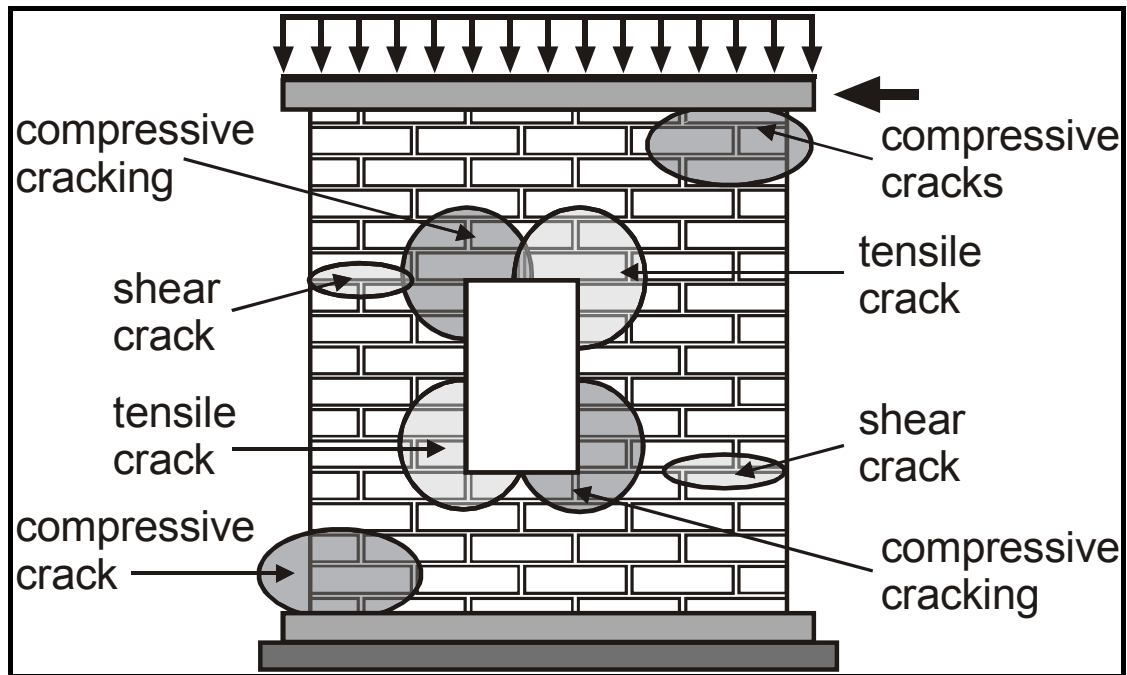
Modes of failure for shear walls with opening [112]
